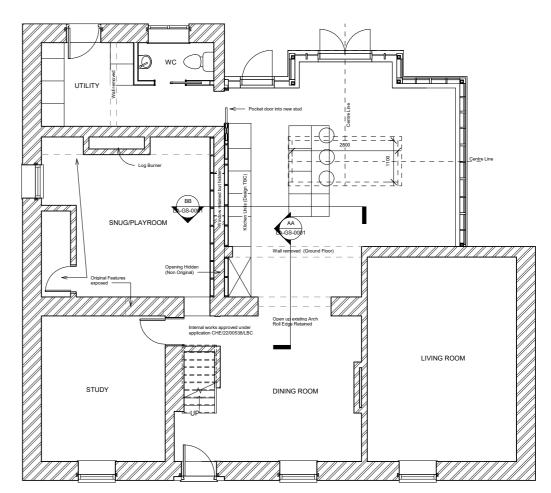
Proposed Ground Floor Plan, not to scale © Lang Architecture
